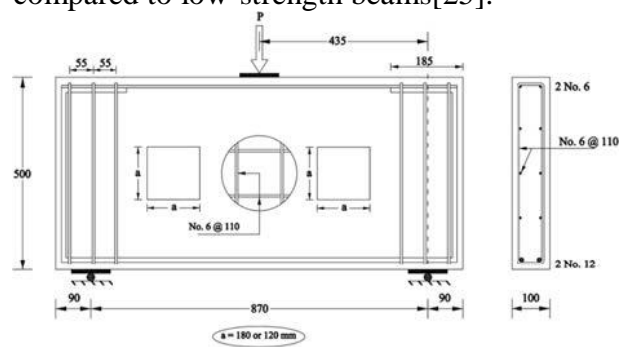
Group A, B, E and F Beam Detailing (units in mm)[25].
